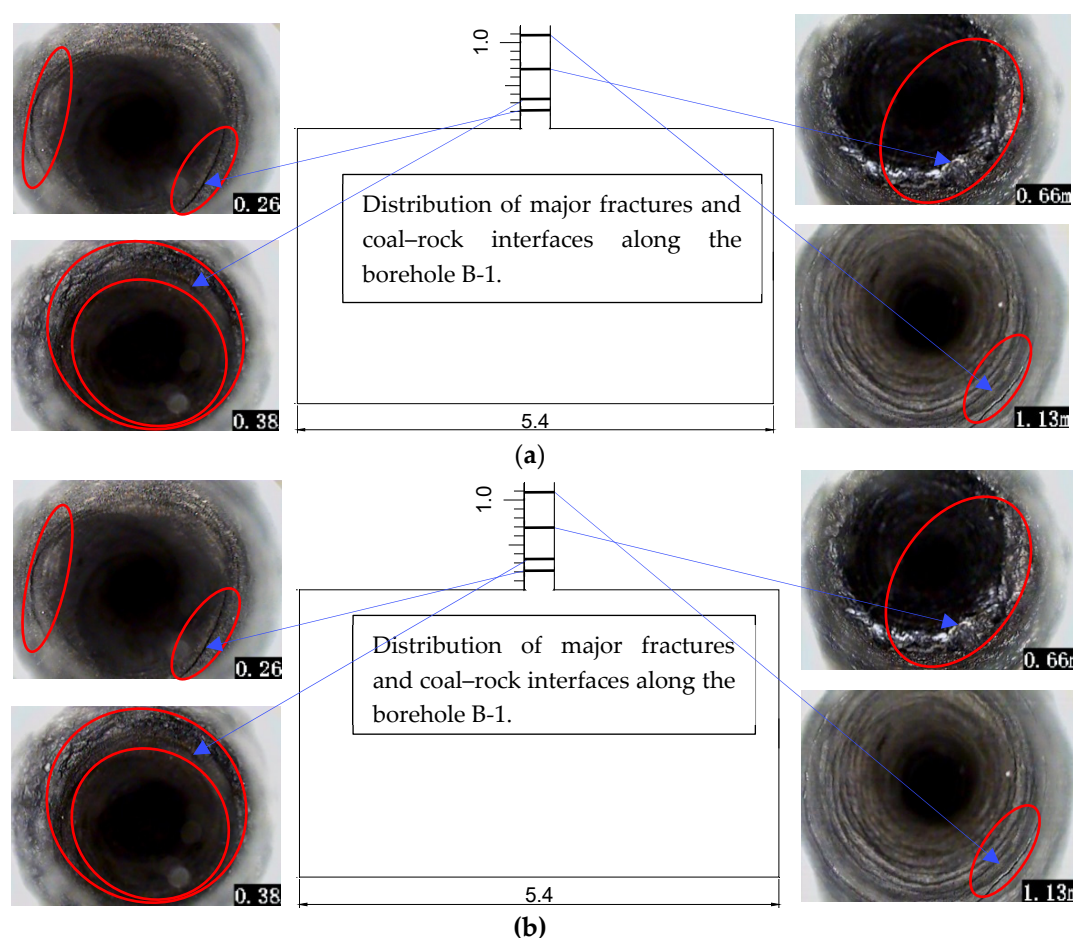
Fracture development of roadway roof; (a) B-1; (b) B-2 (Unit: m).
